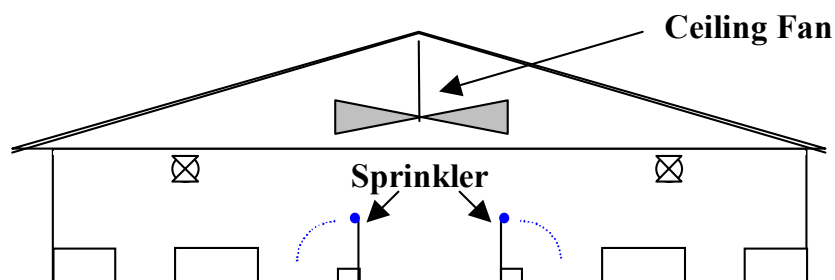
Sprinkler lines, vertical fans and ceiling fan.
